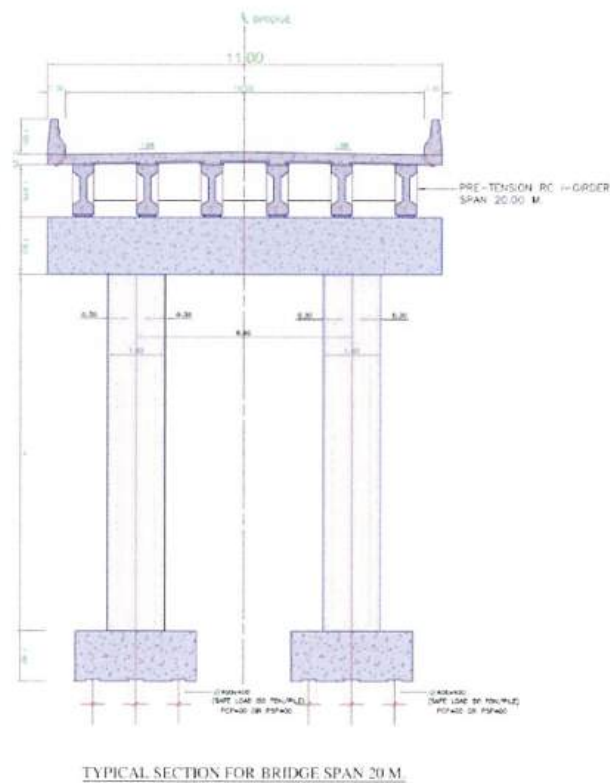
STRUCTURAL SCHEME PRECAST RC I-GIRDER 20M SPAN BRIDGE
